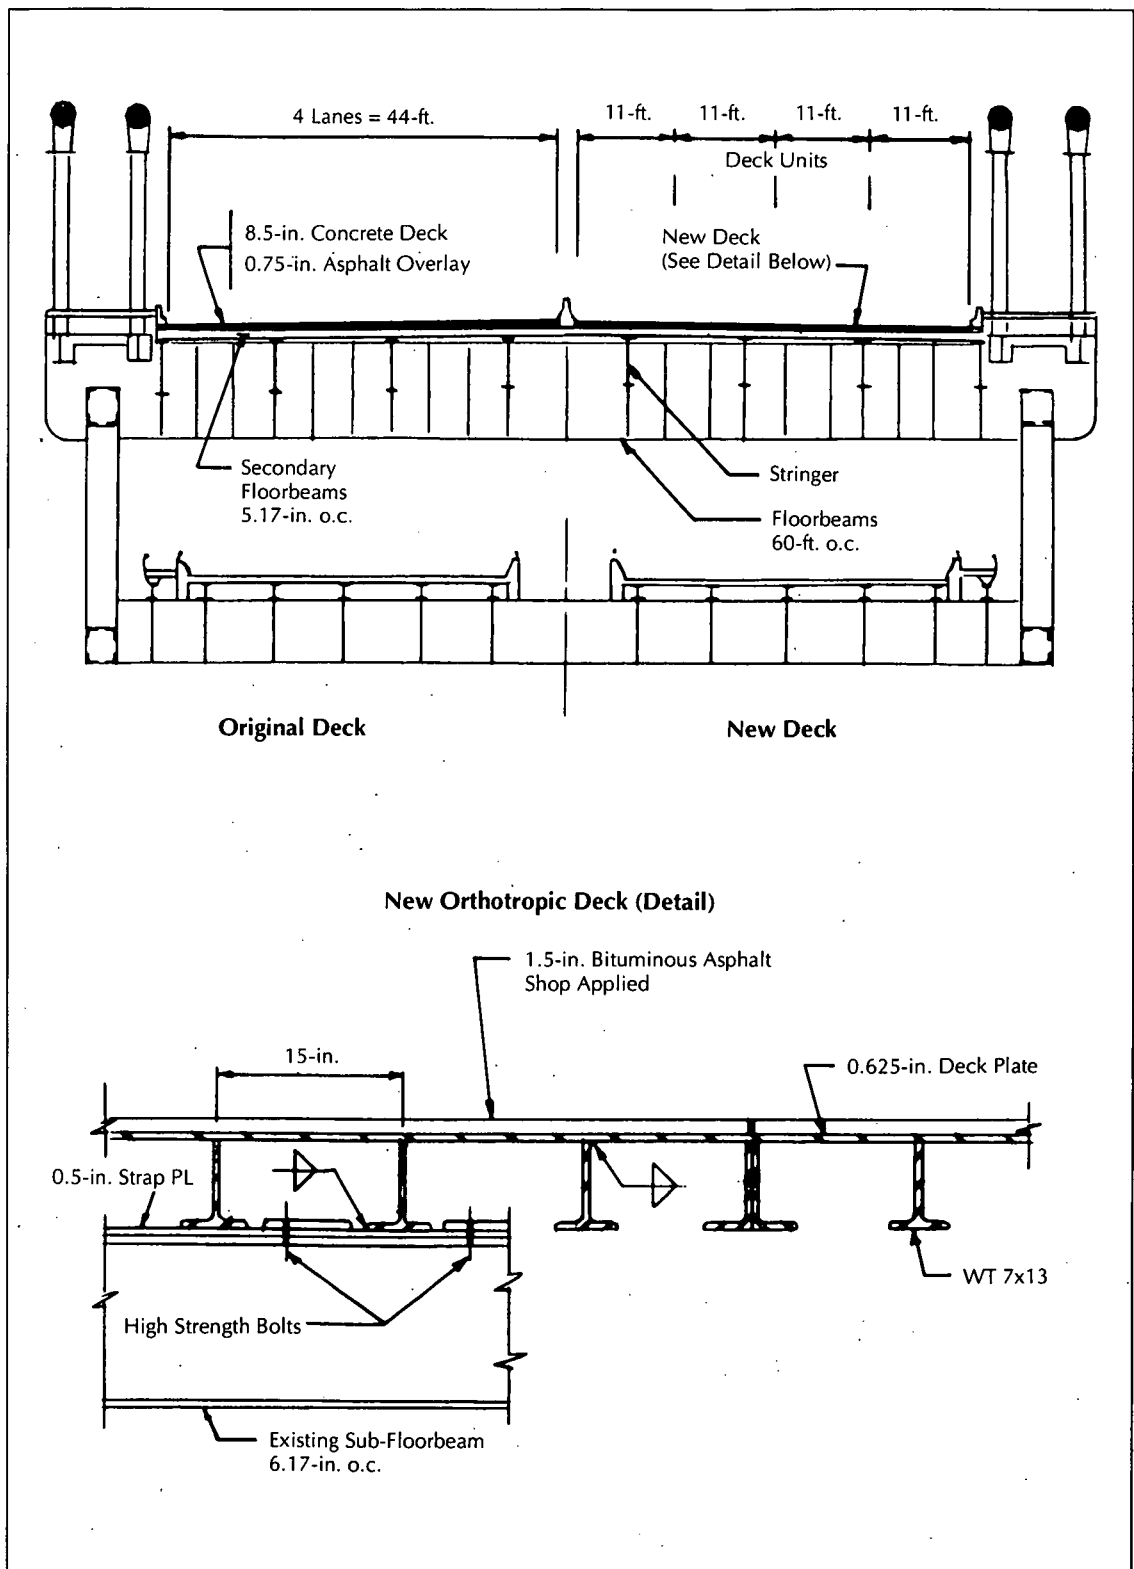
The George Washington Bridge orthotropic steel deck.
